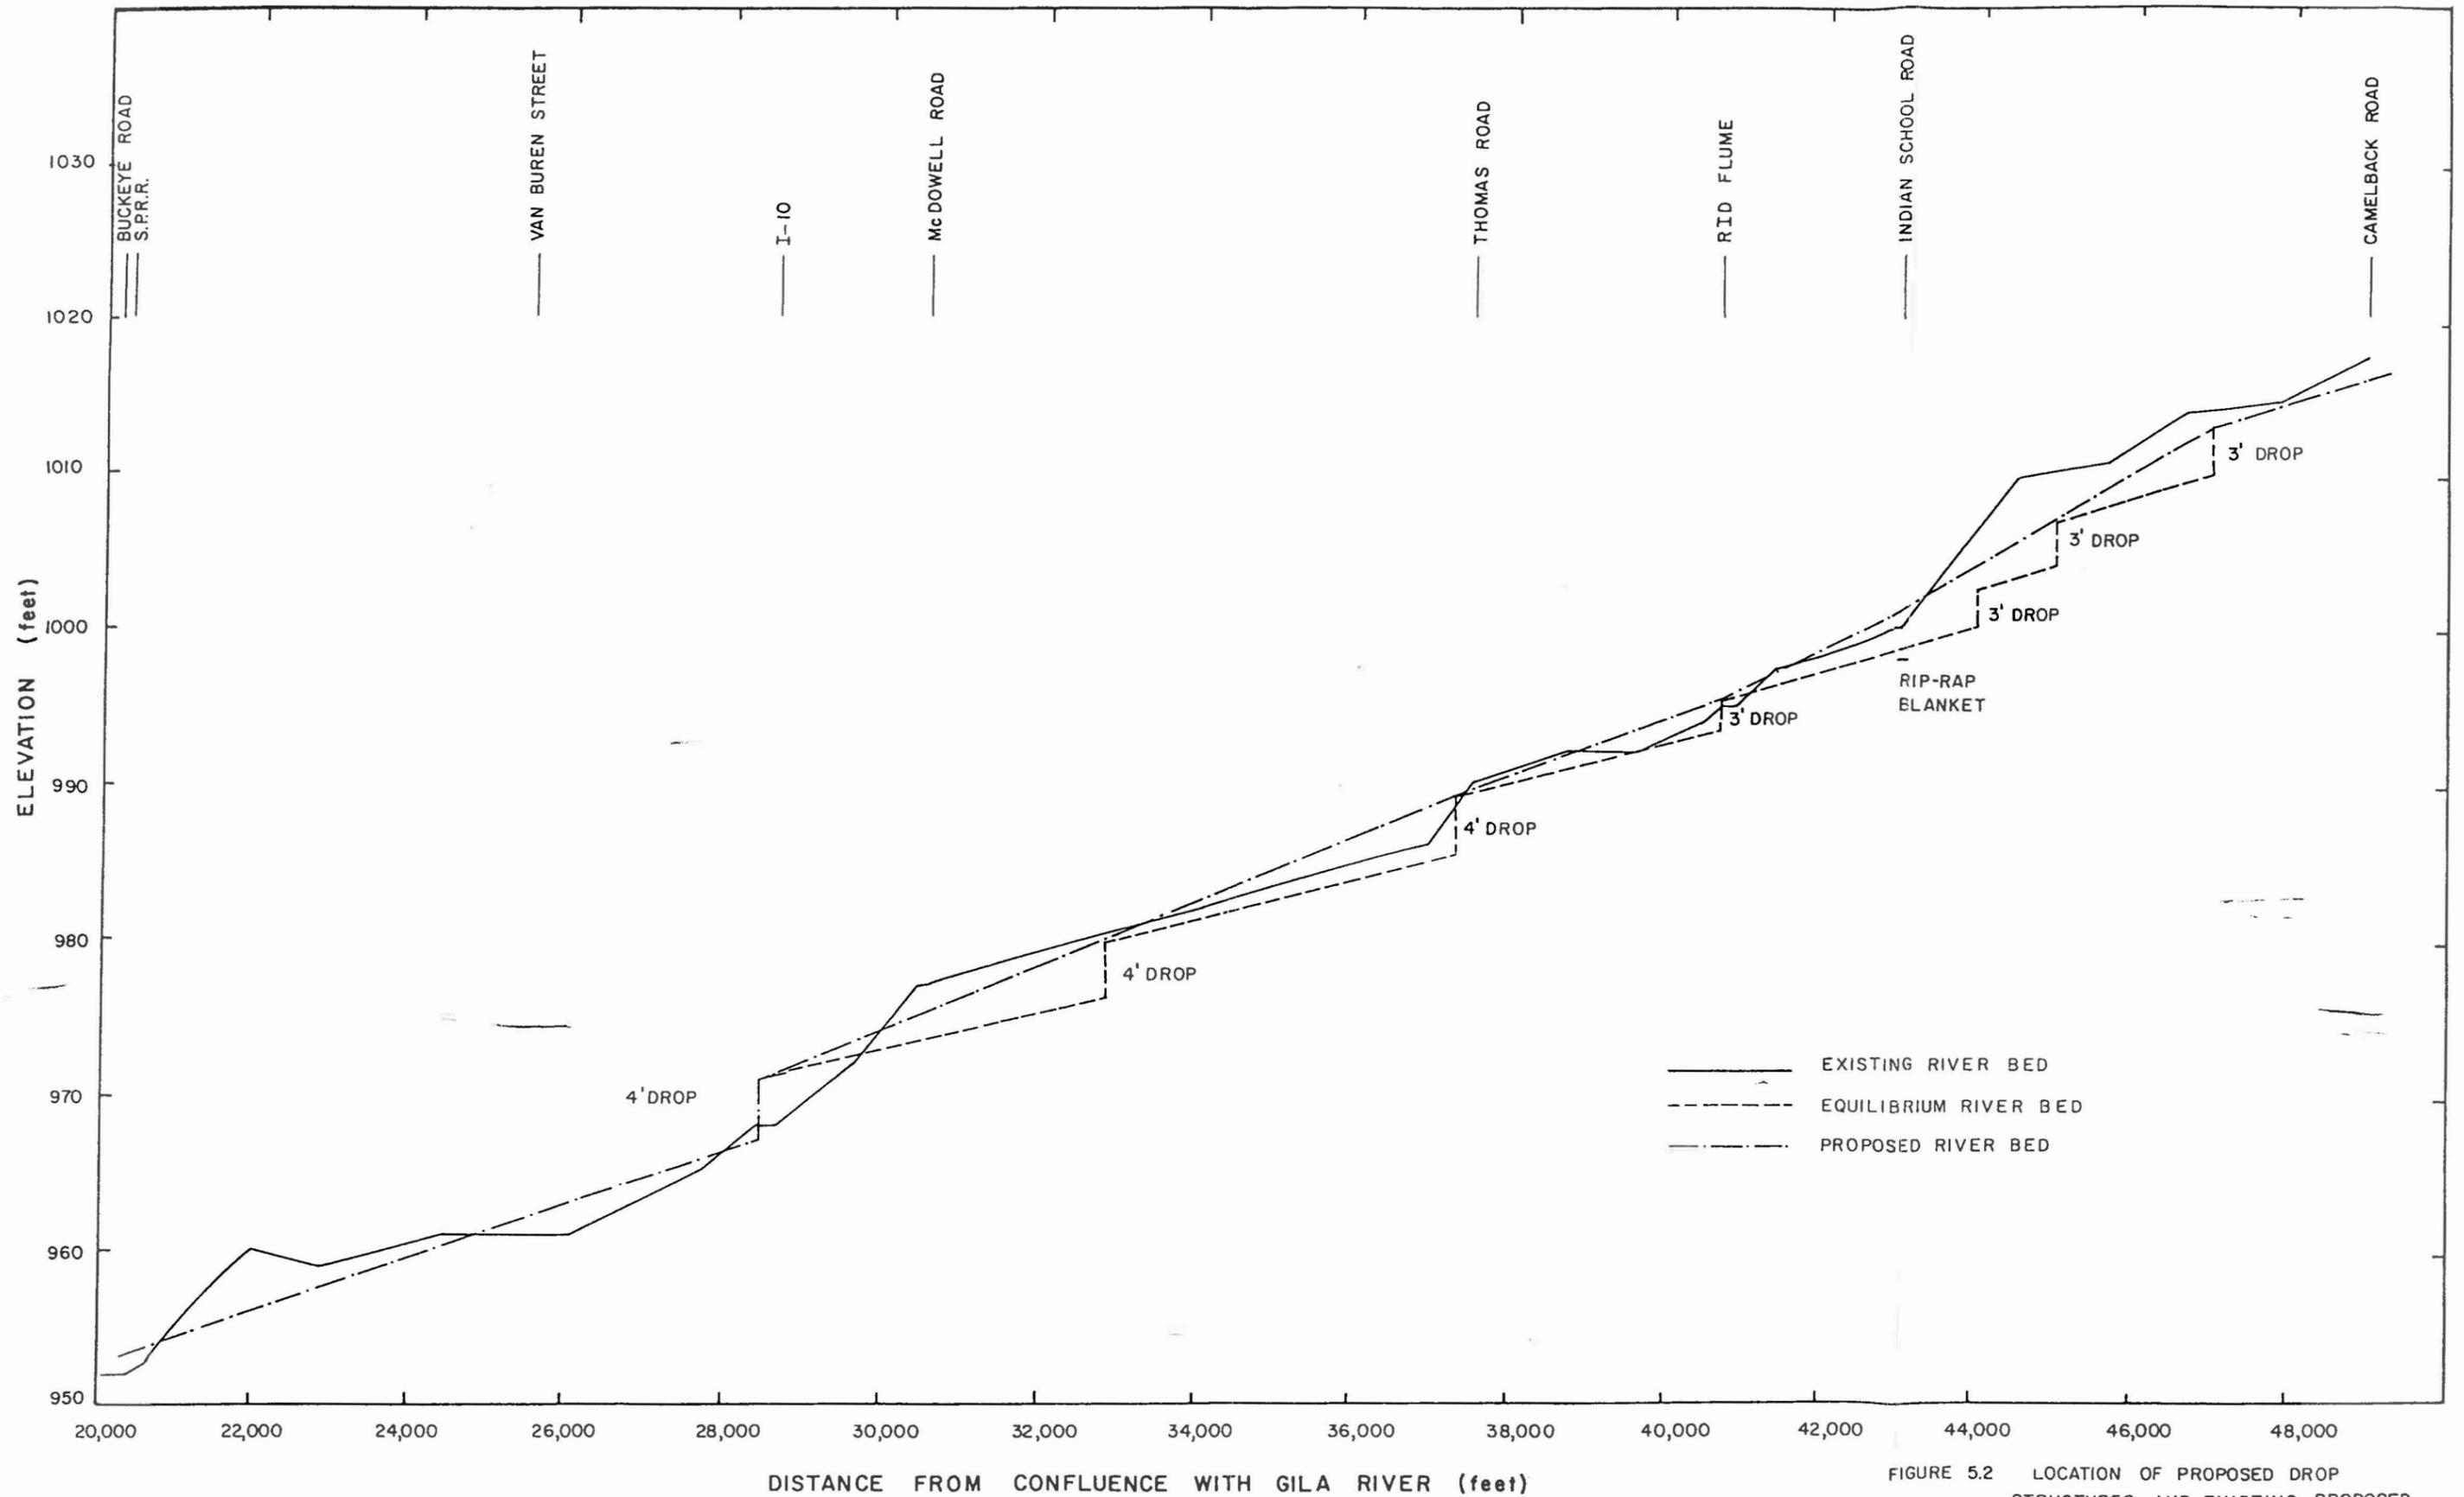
LOCATION OF PROPOSED DROP STRUCTURES AND EXISTING, PROPOSED AND EQUILIBRIUM BED PROFILES.
